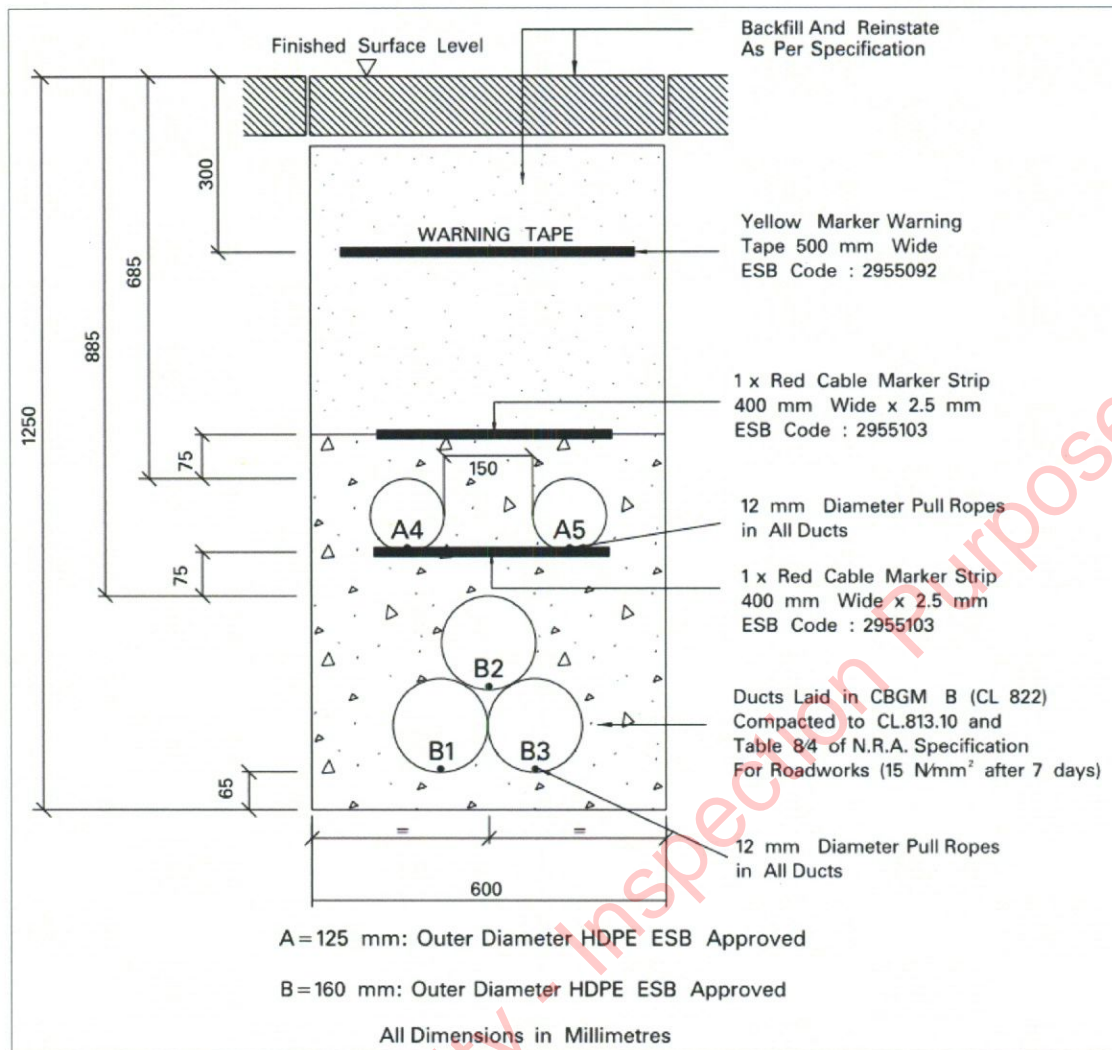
Typical Cross Section of Trench Trefoil Duct Arrangement for 110 kV underground cables
